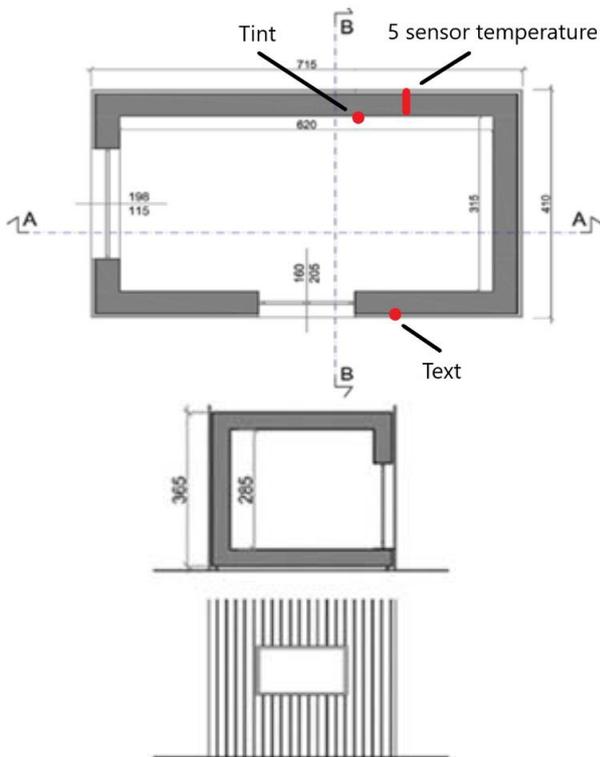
Planimetry, vertical section B-B and the prospectus with the window of the straw house.
